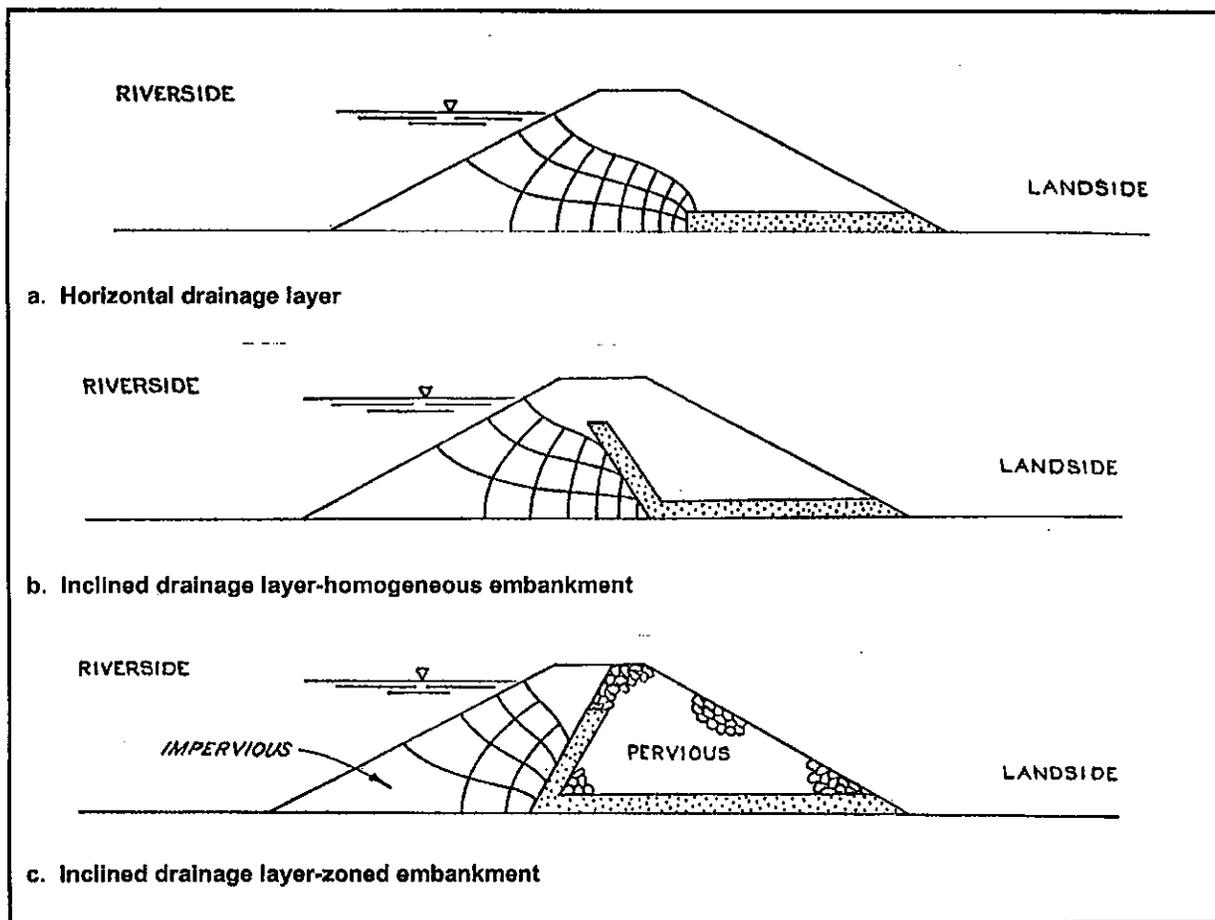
Use of horizontal and inclined drainage layers to control seepage through an embankment
